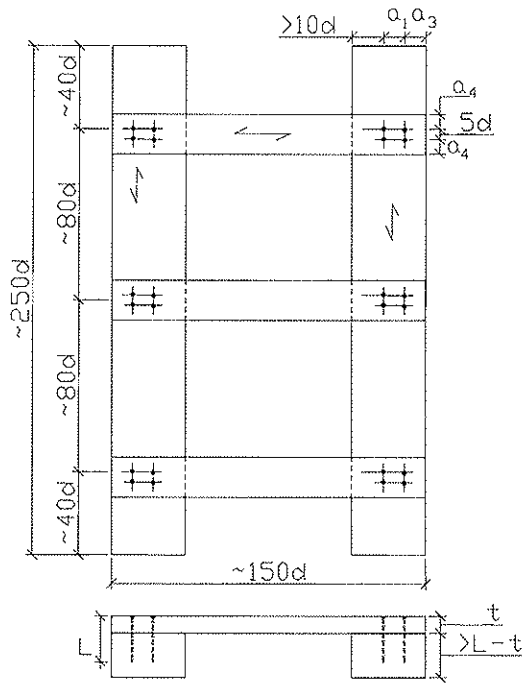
Test specimen of cross joints (F-series 90°). Each of test specimens had six similar joints (1 test series = 1 test specimen).
